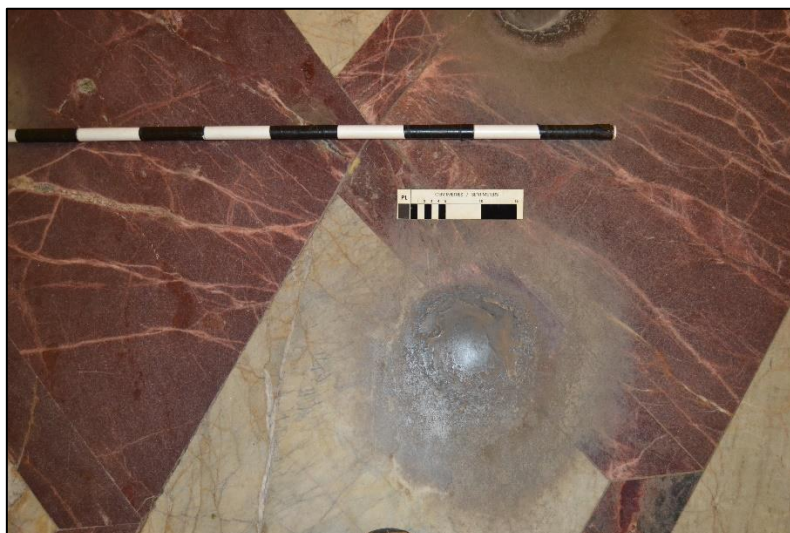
Extent of the water damage to the floor due to dripping from the ceiling (scale bar 1m long) (Photograph: M. Naudé 2020)
